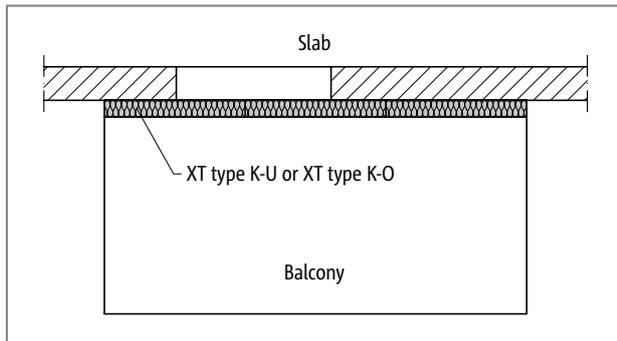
Schöck Isokorb® XT type K-U/K-O: Cantilevered balcony
